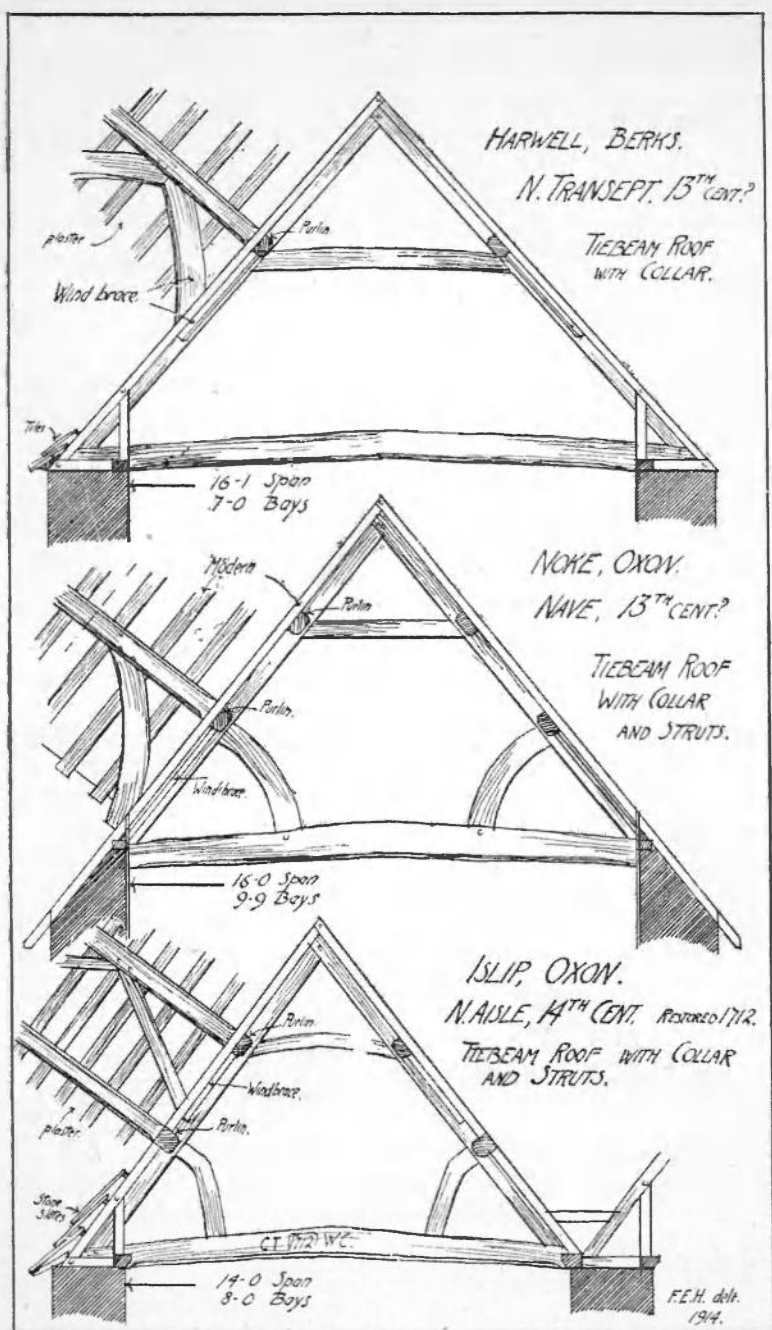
TIE-BEAM ROOFS WITH COLLARS.
